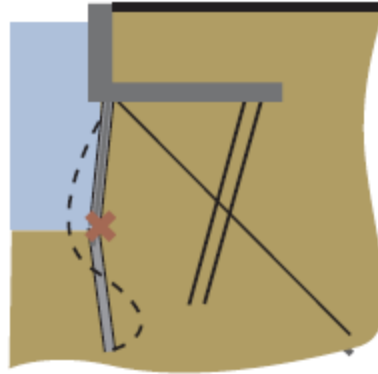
Failure of the retaining wall. Source: Roubos et al. (2018)
